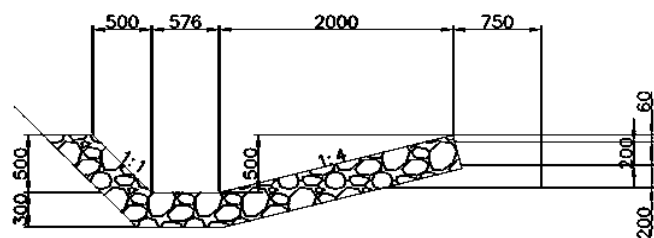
Longitudinal/Cross-Sectional Drainage Facilities
